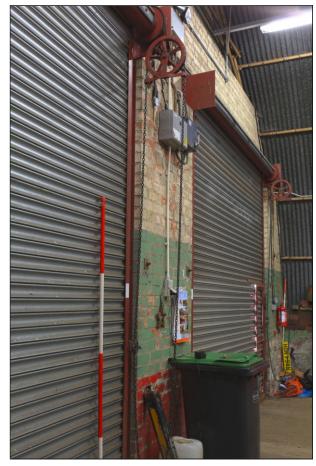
Detail of typical opening mechanism for the roller shutter doors
